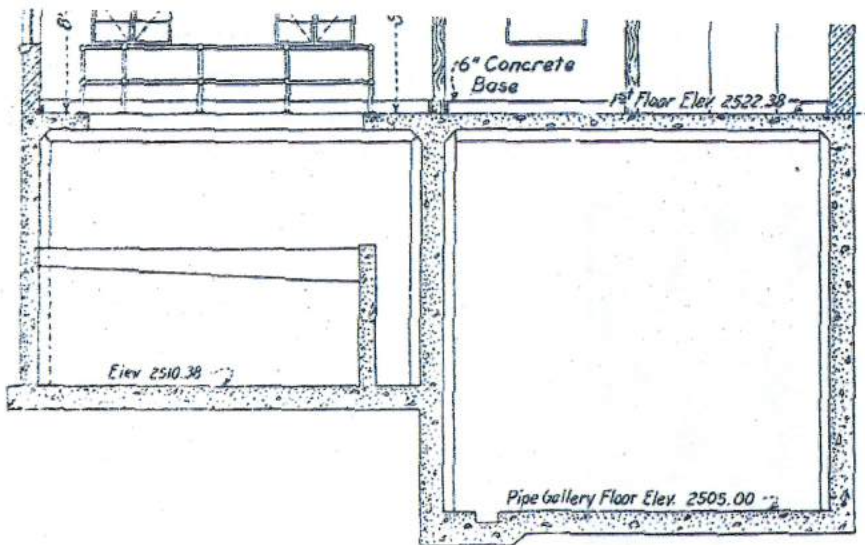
Section Showing Concrete Foundations Walls at Filter Beds (left) and Pipe Gallery (right)
